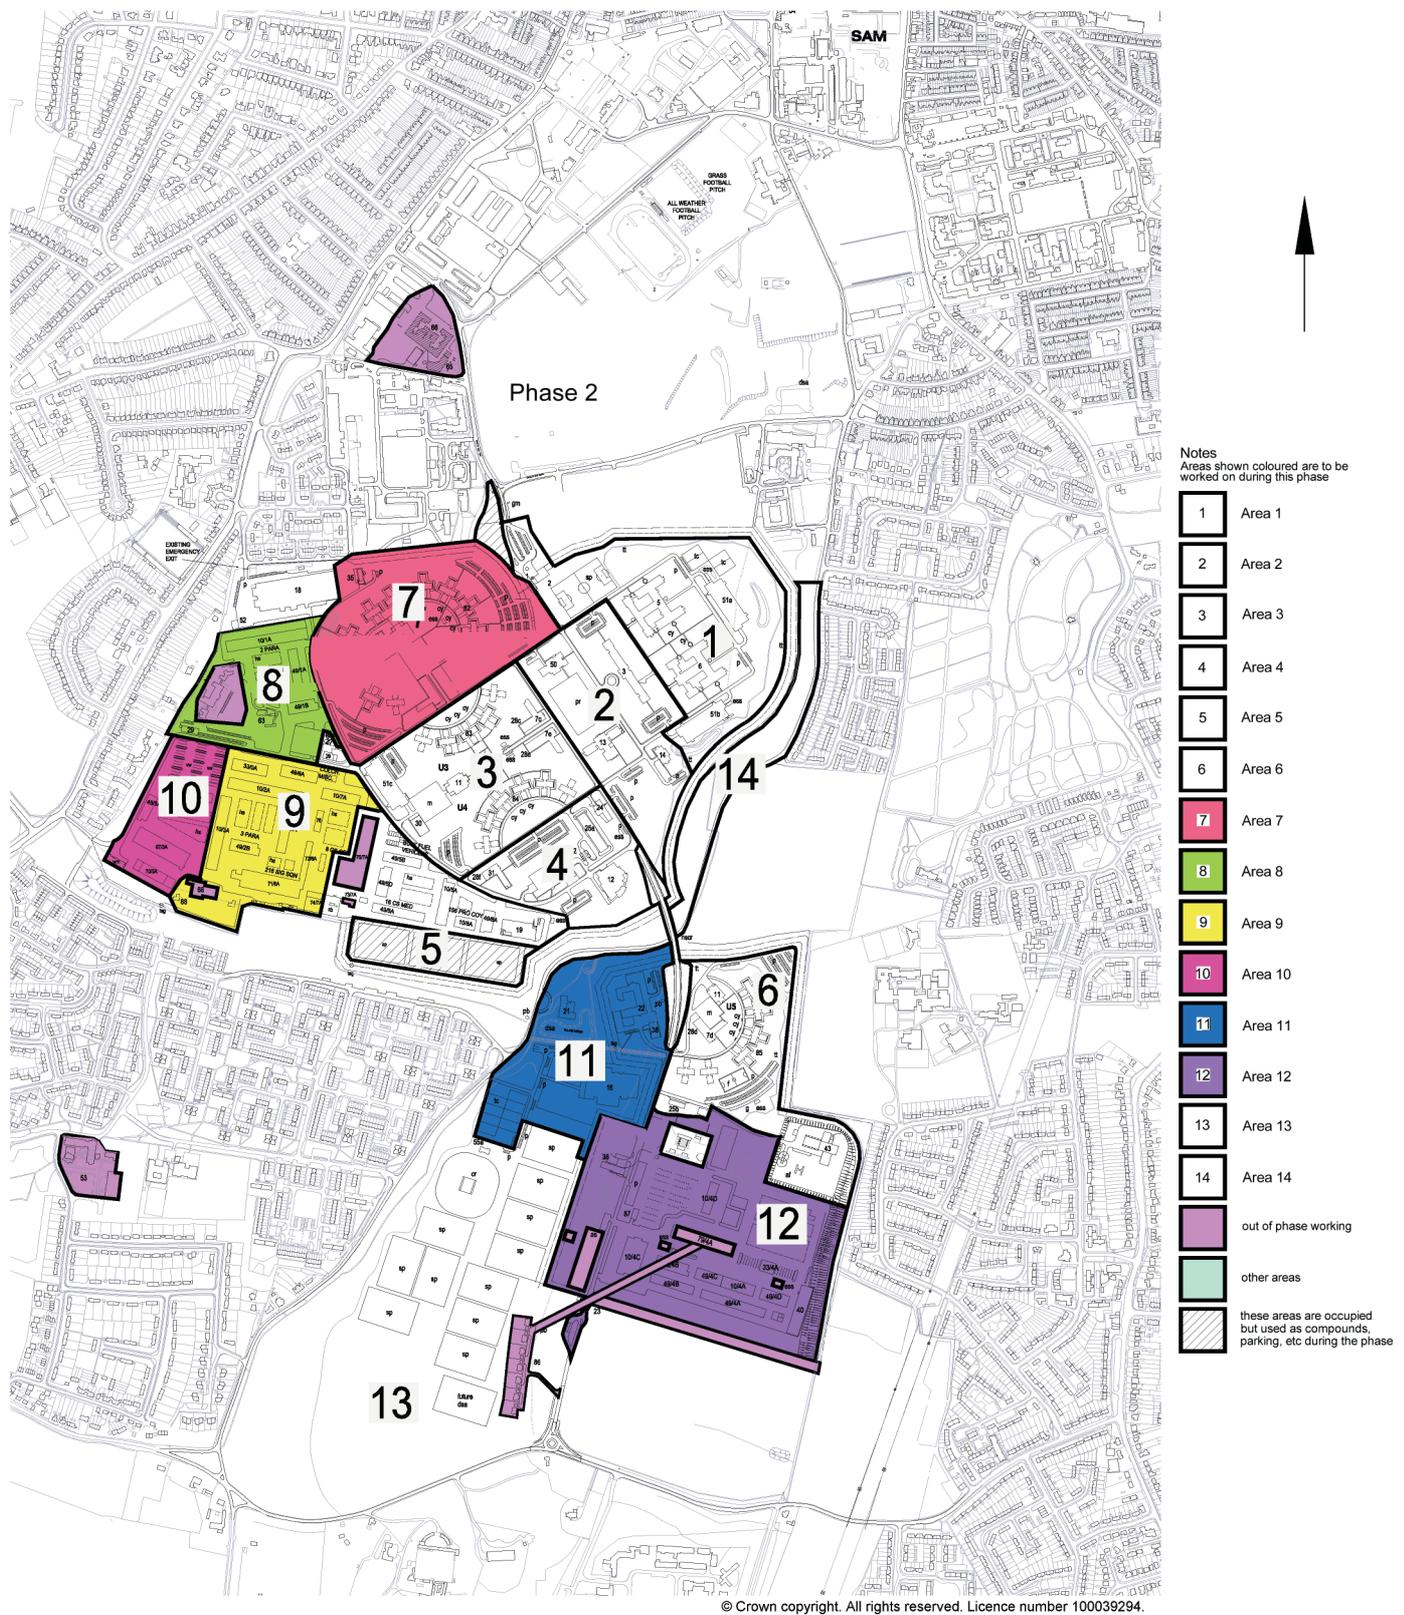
Colchester new garrison PFI project: development Phase 2 plan. (Not to scale.)
